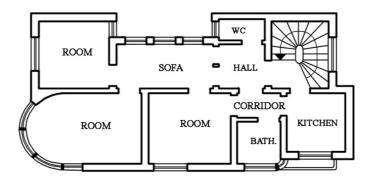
Typical floor plan of Süleyman Sırrı Bey Apartmanı, 1930.
